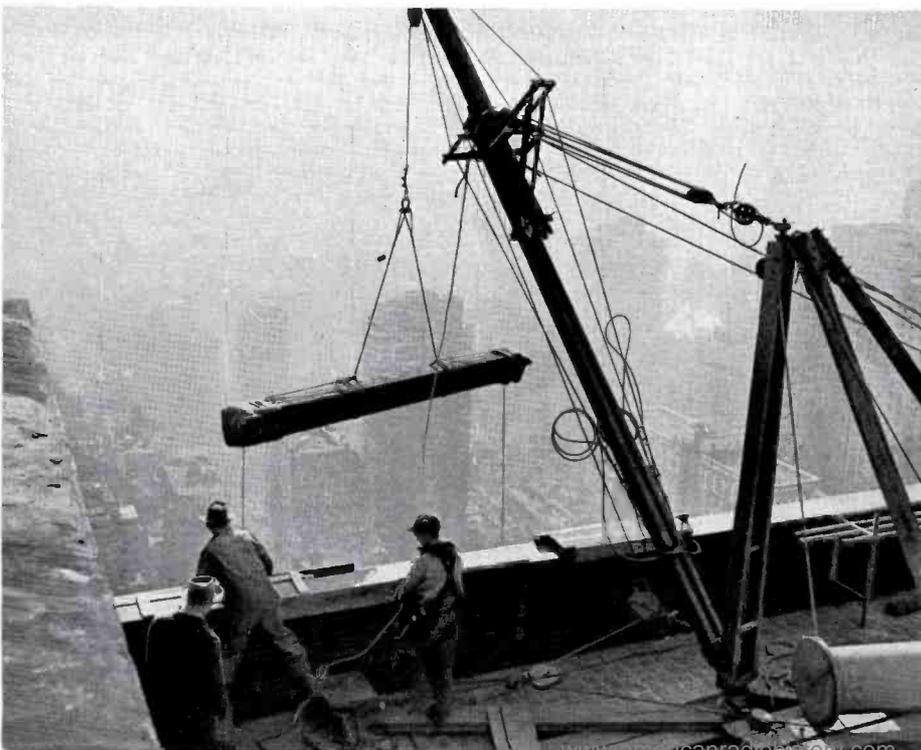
(left). Much of the material had to be raised from street level on the outside of the building. Here a section of the Pylon reaches the roof level.
